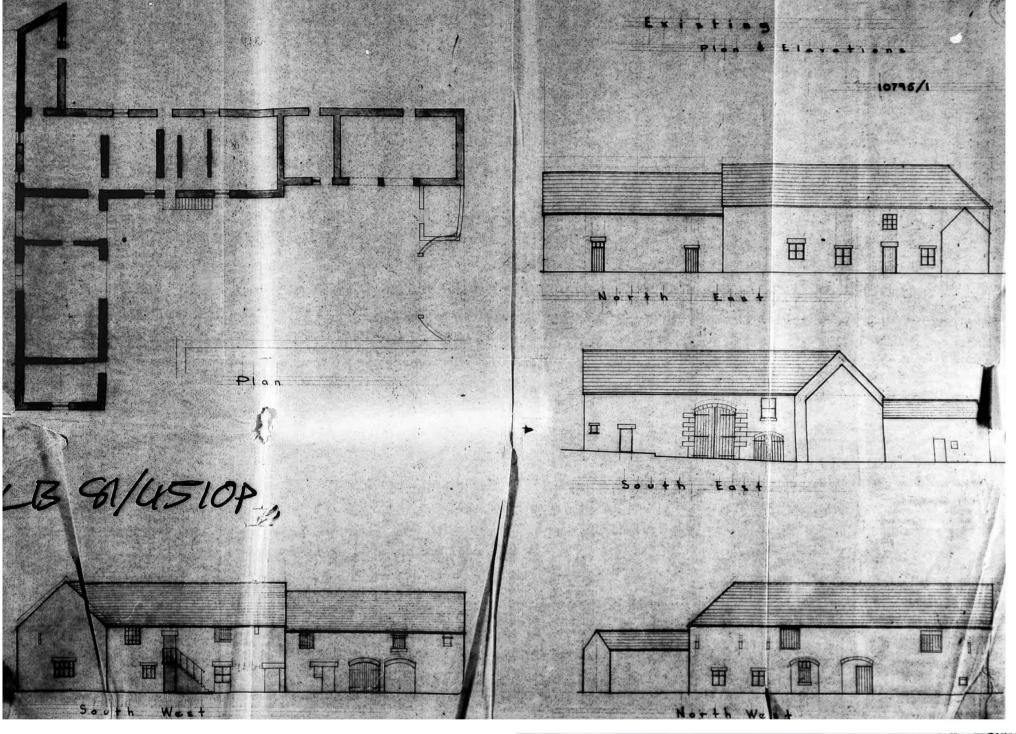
Listed barn original elevations from 1981 conversion planning application and 2021 photo of NW elevation Address:
